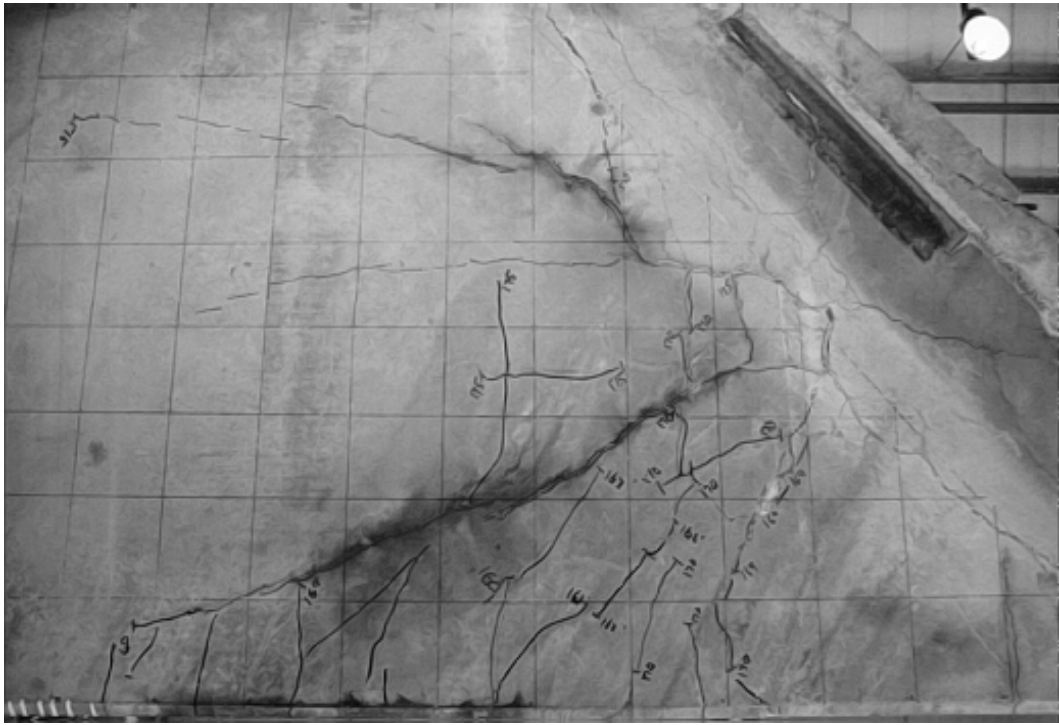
Photograph after Testing of Beam Underside, Box Beam 3 - Test 1
